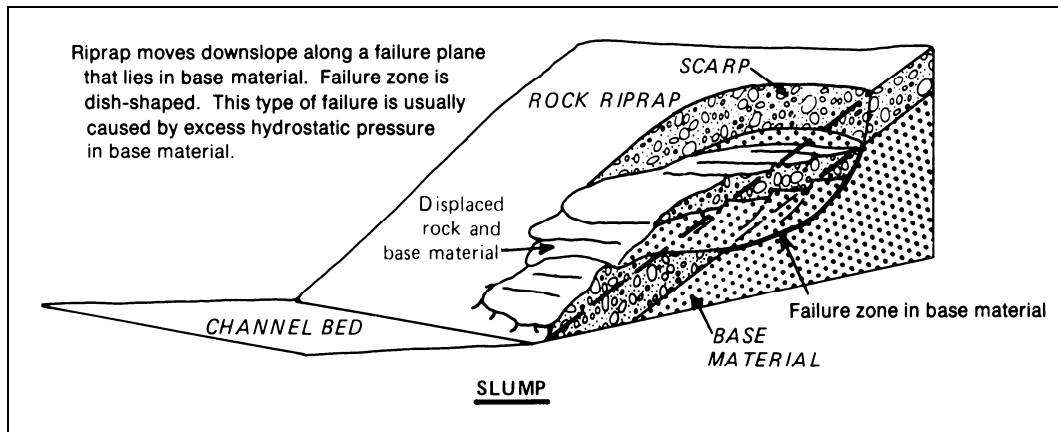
Riprap failure due to slump (Blodgett and McConaughy 1986).
